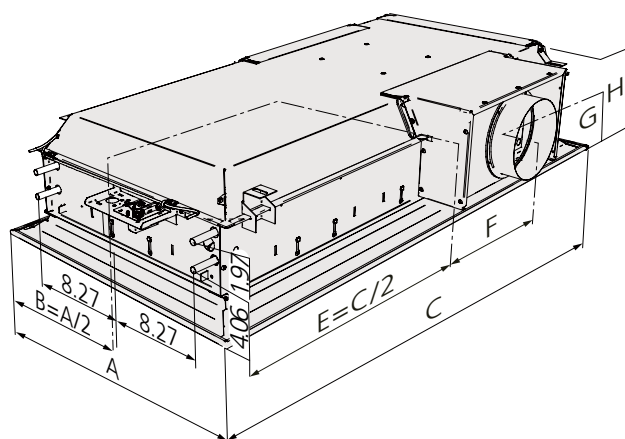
Dimensional drawing - long side connection (the length 4 ft.) with air connection on side 2 is shown in the example).
